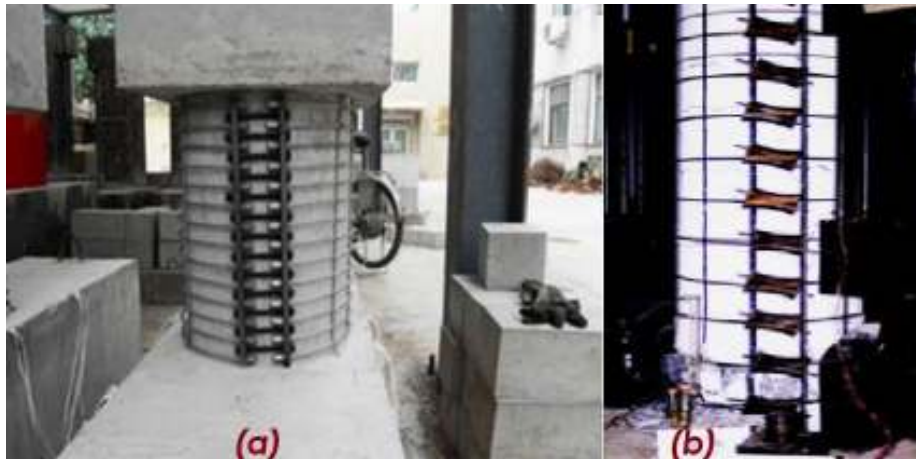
Concrete specimens confined with prestressing steel strands. (a) Daud and Hui (2014), (b) Saatcioglu and Yalcin (2003)
